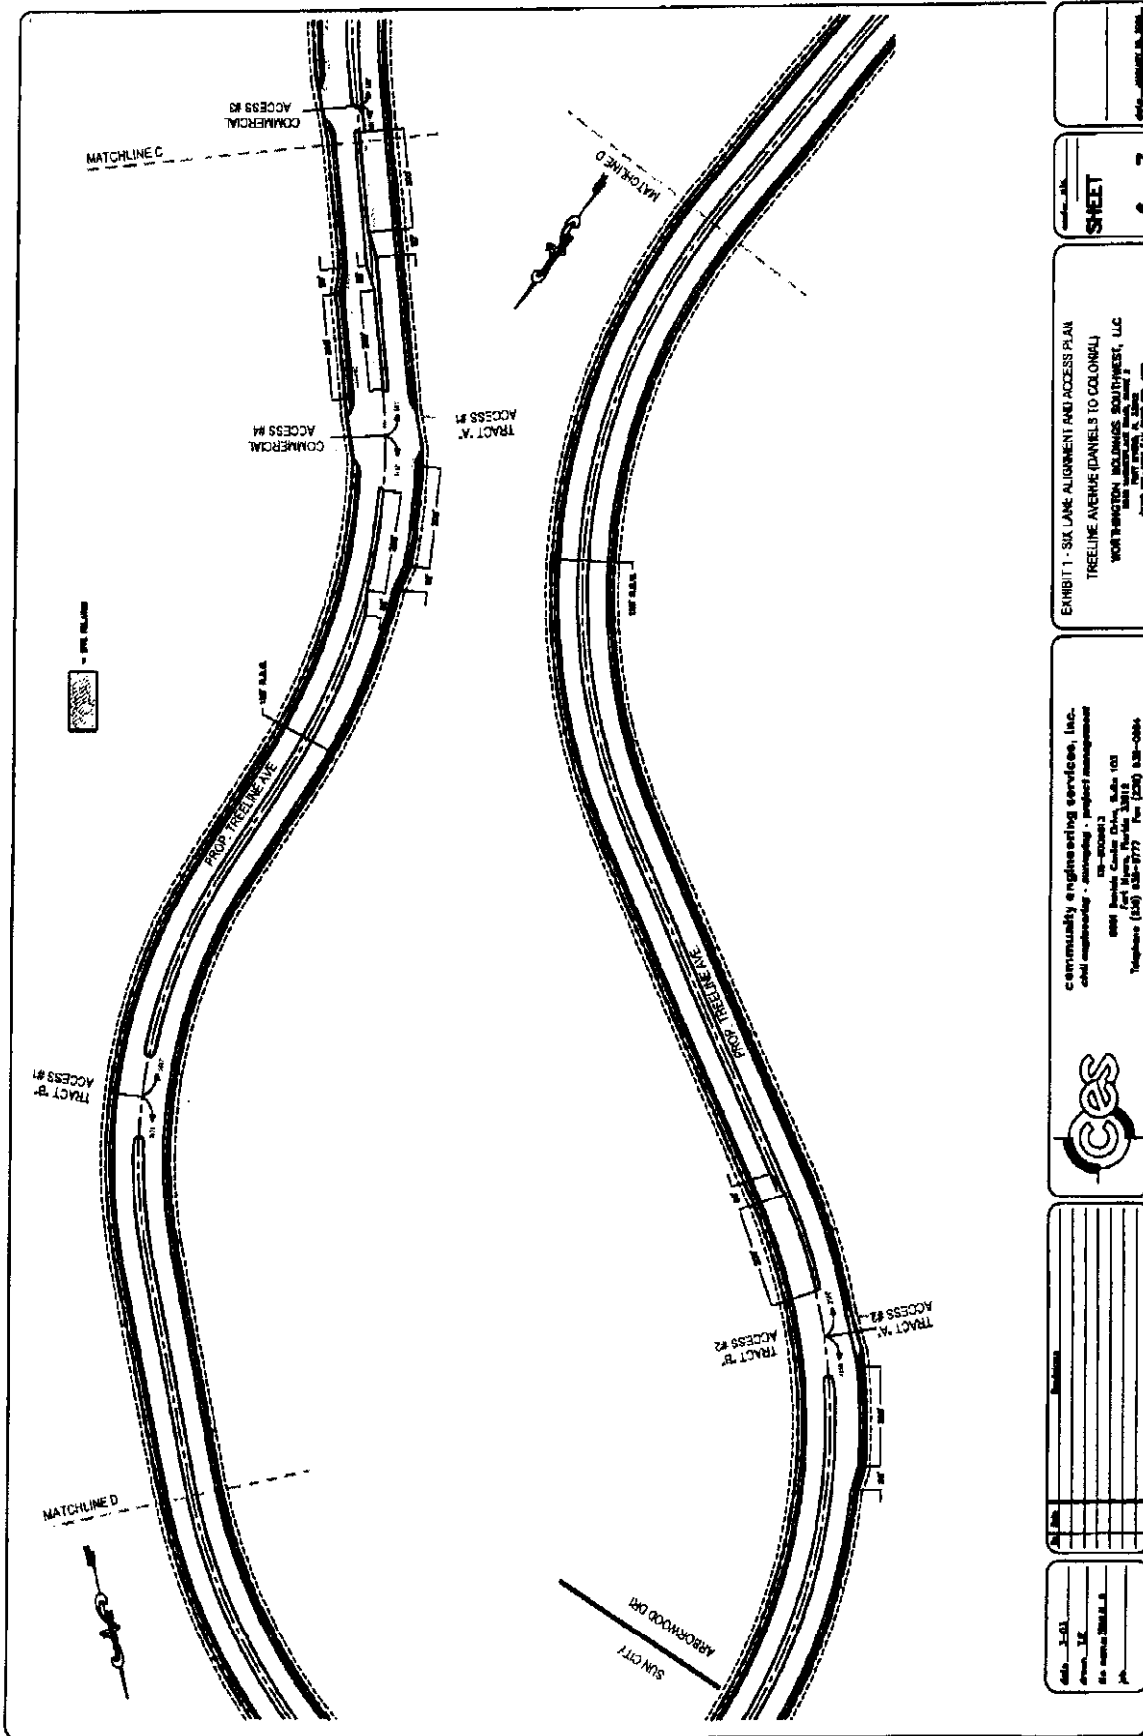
SIX LAKE ALIGNMENT AND ACCESS PLAN
